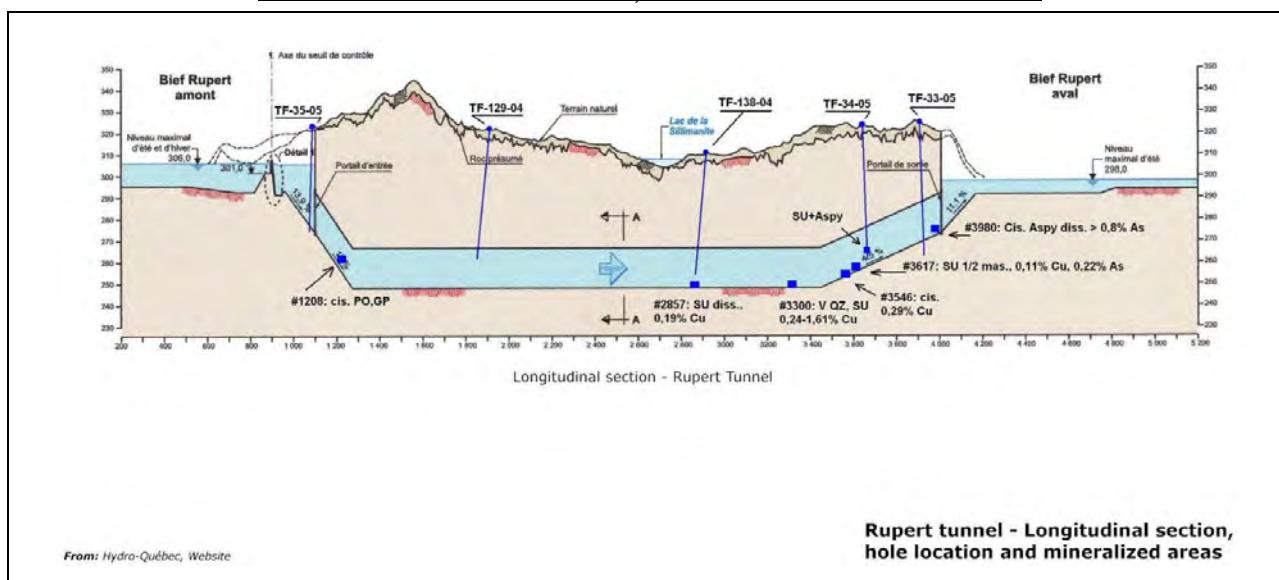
RUPERT DERIVATION TUNNEL, LONGITUDINAL SECTION
